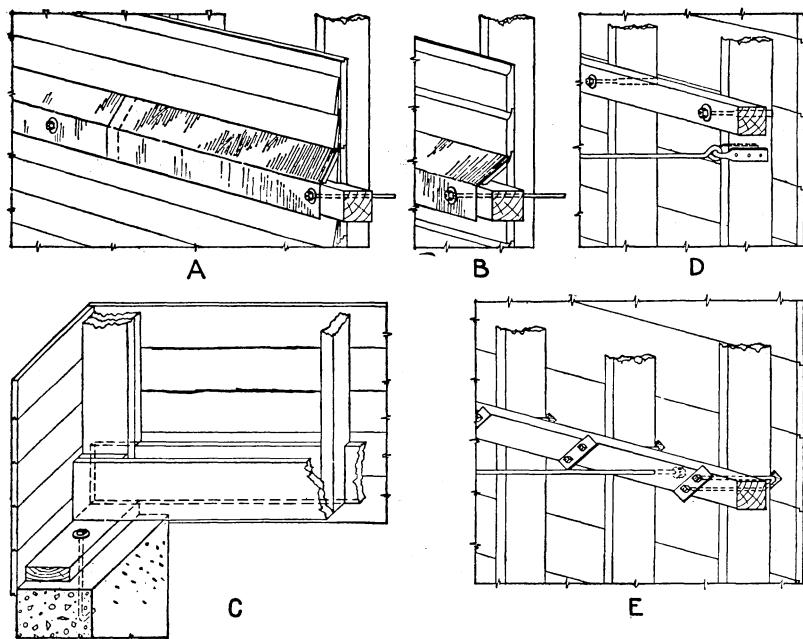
Bin-wall details: A, Exterior stay timber with flashing on double-boarded wall; B, flashing with single boarding; C, framing of studs, joists, and sill at corner of a granary; D, stay timber secured with wagon-box bolts, the tie rods being secured to studs; E, inside stay timber secured to studs with U bolts, the tie rods extending through the timber
